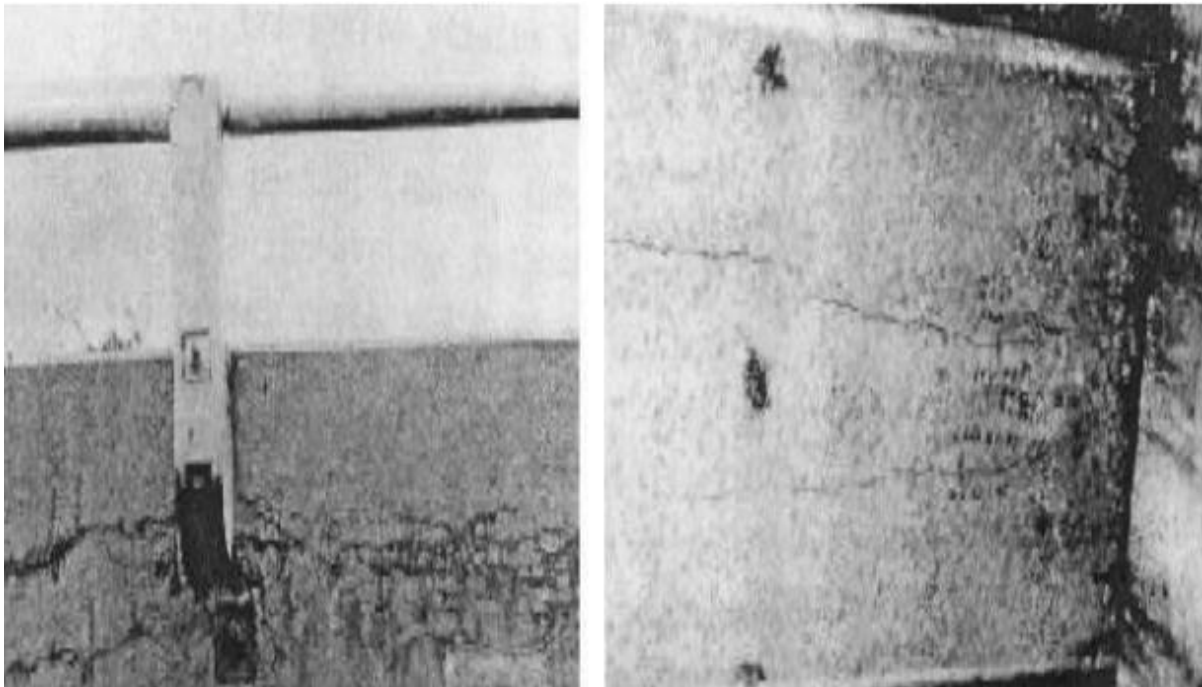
Shows severe Cracking Caused by ASR on the Susan River Bridge
